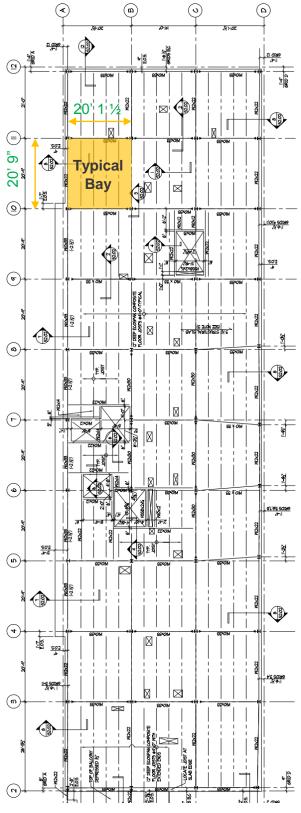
Typical Floor Plan, Grid in new steel floors matches original building's grid, S1.07
